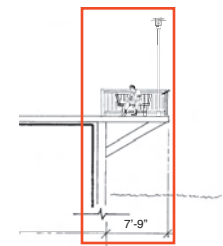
C.7: Cross Section B-B' of Proposed Promenade Overlook (Option 2)
